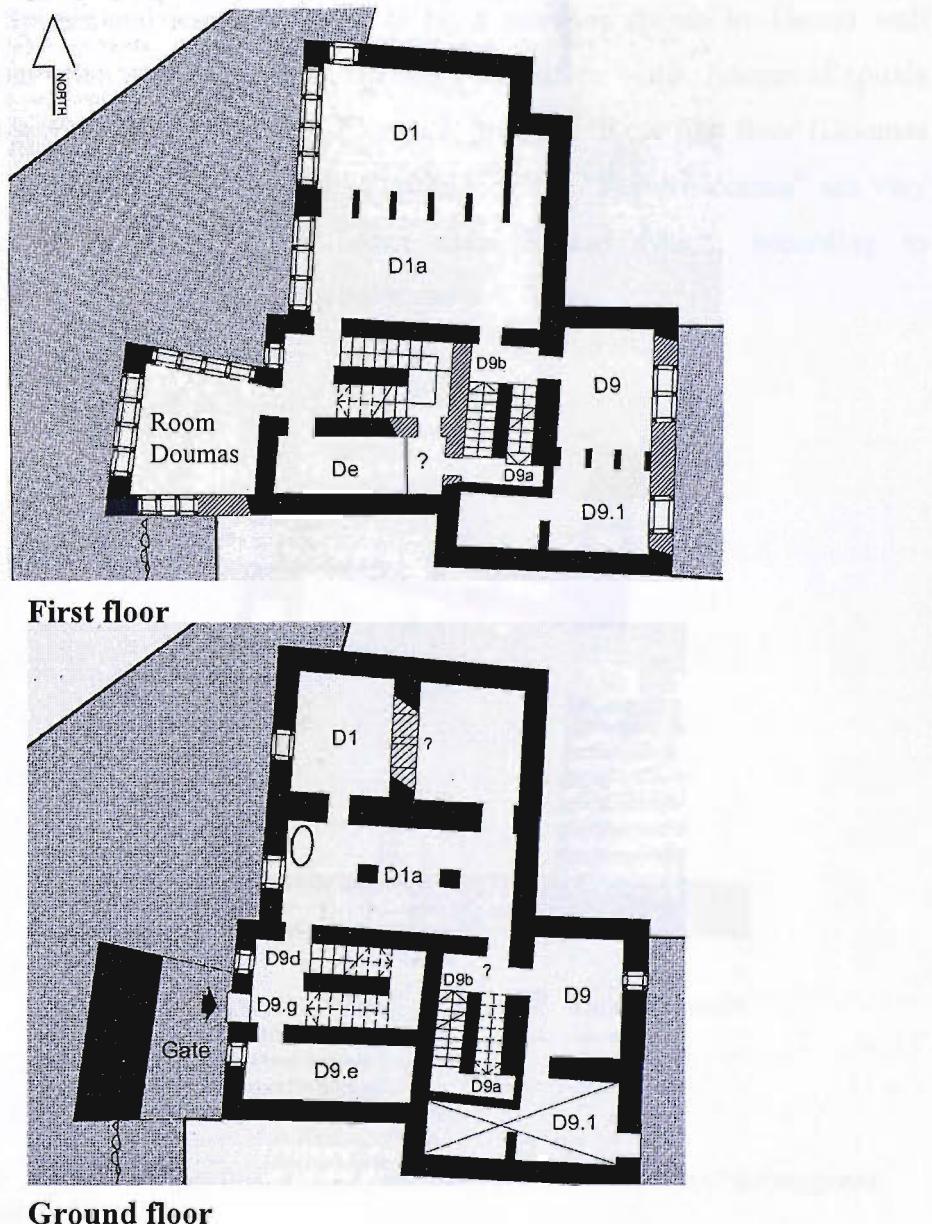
Plan of the ground and first floor of Delta West (from Palyvou 2005a, p.76). Hatched walls are indicated.
